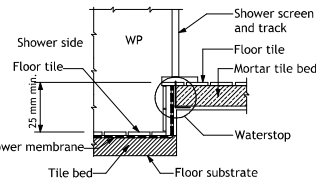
Typical unenclosed stepped down shower construction (membrane below tile bed)
